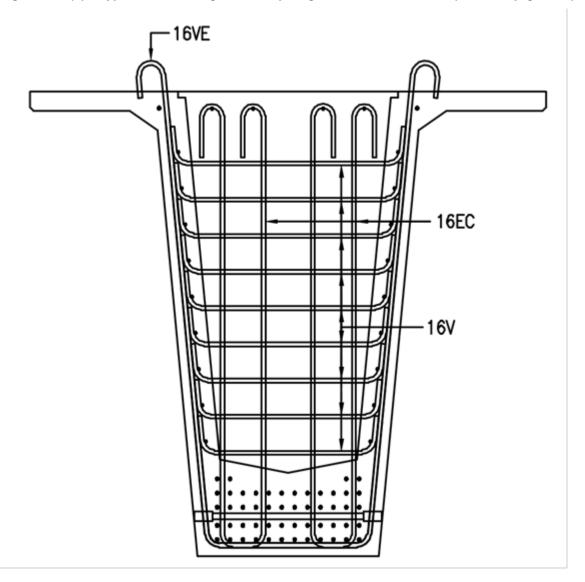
(c) - Typical reinforcing set in diaphragms and around voids (1800 deep girders)
